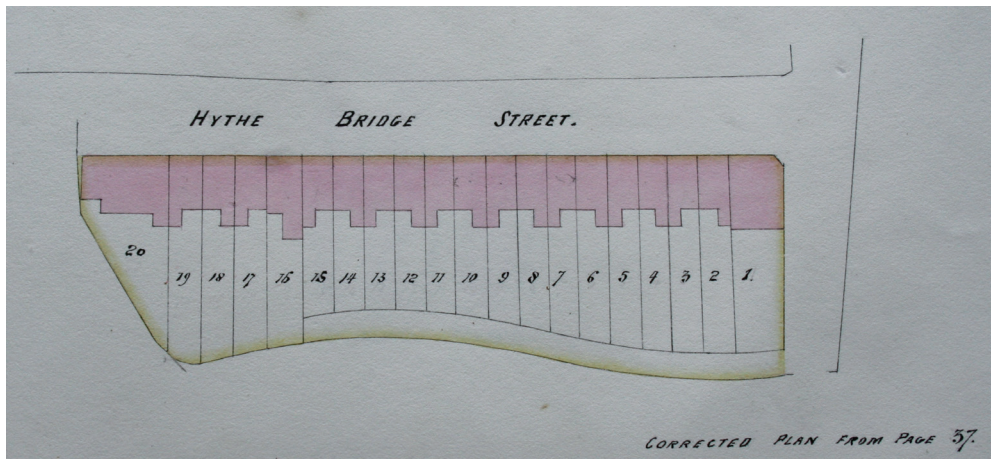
Badcock's 'corrected' but undated plan of the north side of Hythe Bridge Street. CCA, viii.c.2, f. 49. Plot 16 was the Revd Thomas Chamberlain's house, and plot 20 a new church school. Compare with the plan of 1865.
